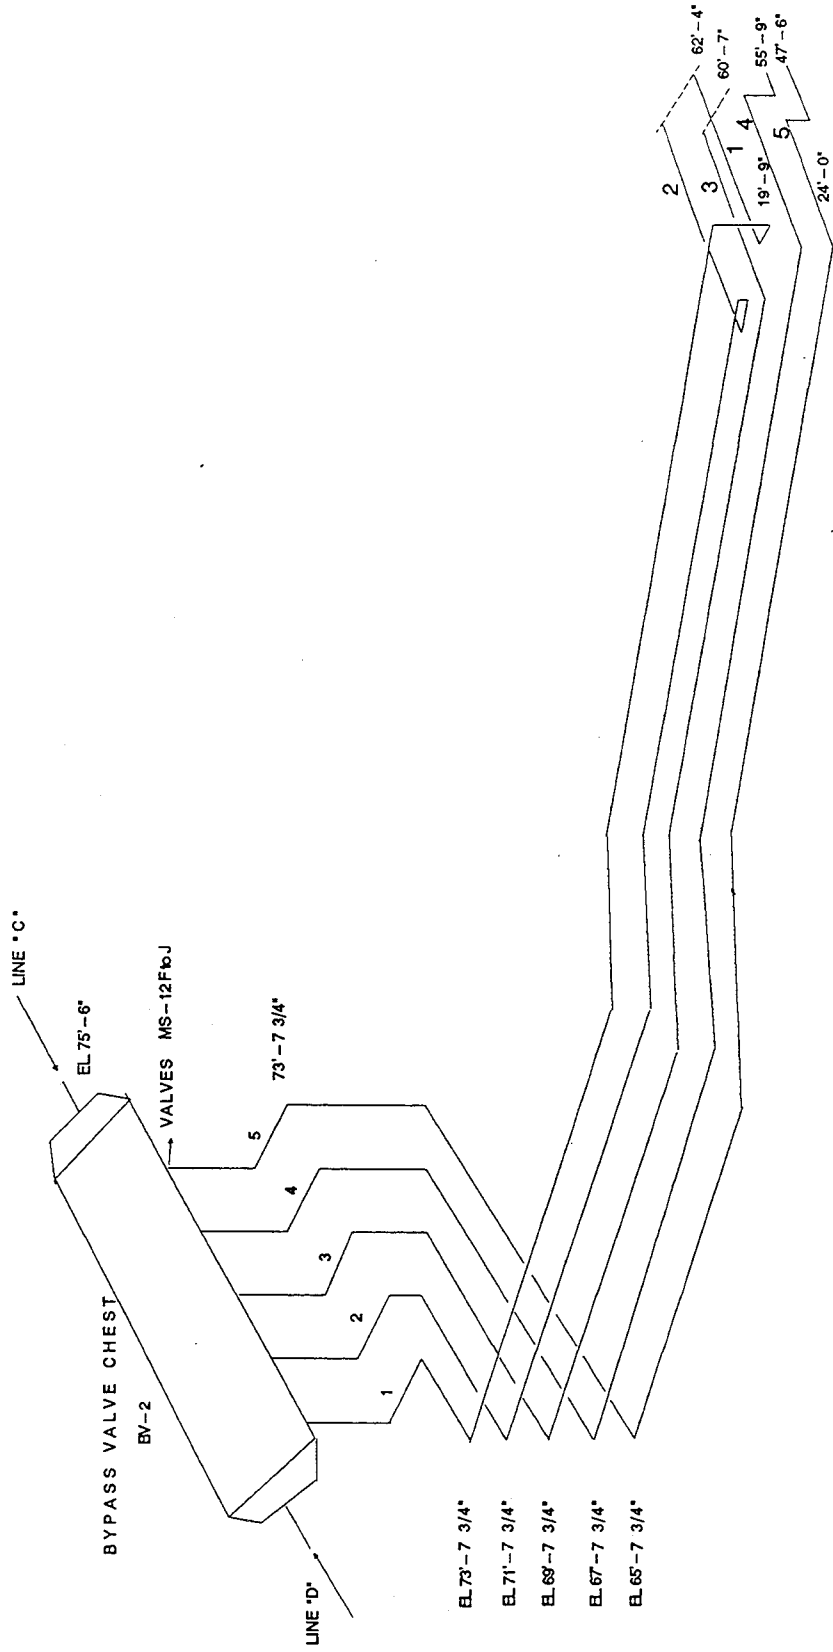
Elevation Diagram for Main Steam Bypass System from Bypass Valve Chest BV-2
